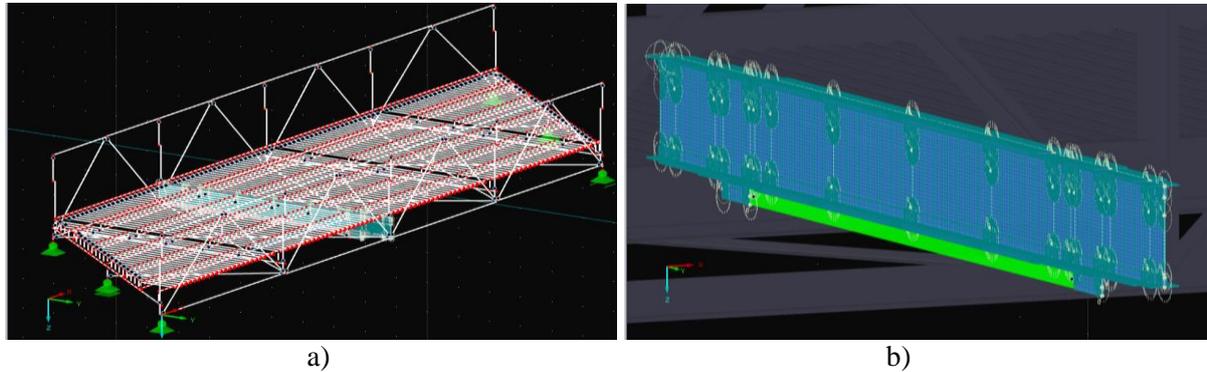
Numerical model: a) whole Petrov bridge b) Strengthened cross girder using shell elements.
